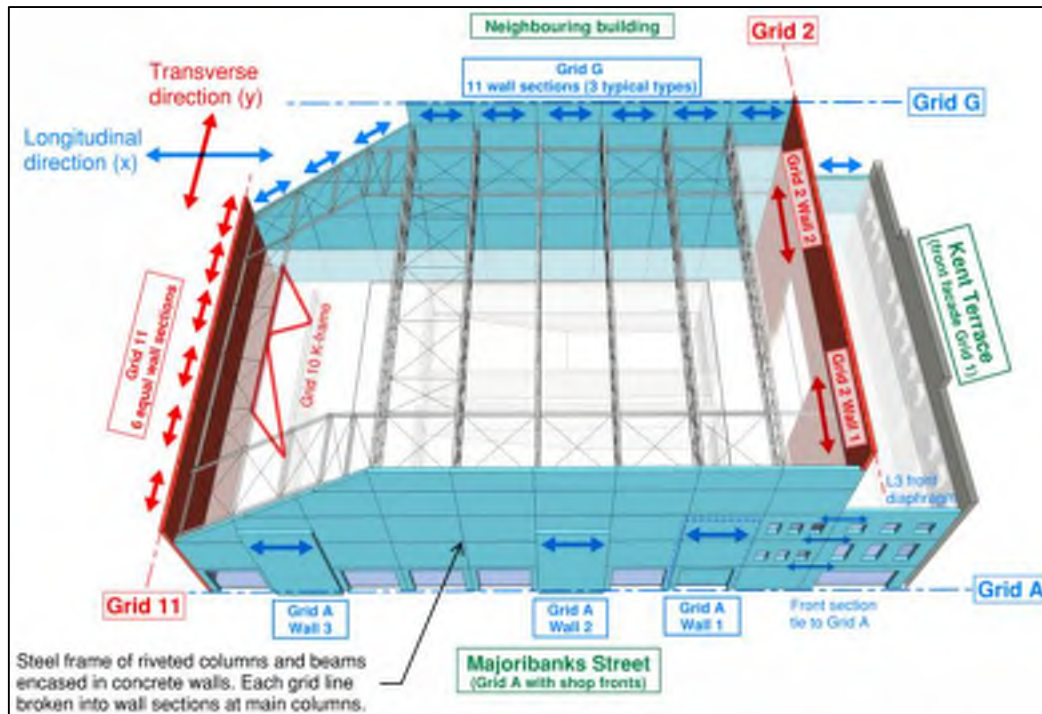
Concrete walls with steel frames provide the primary lateral resisting system in both the longitudinal and transverse directions.
